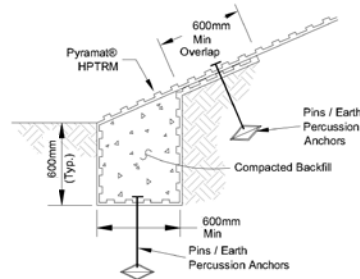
A: INITIAL TRENCH AT TOE OF BANK DETAIL
